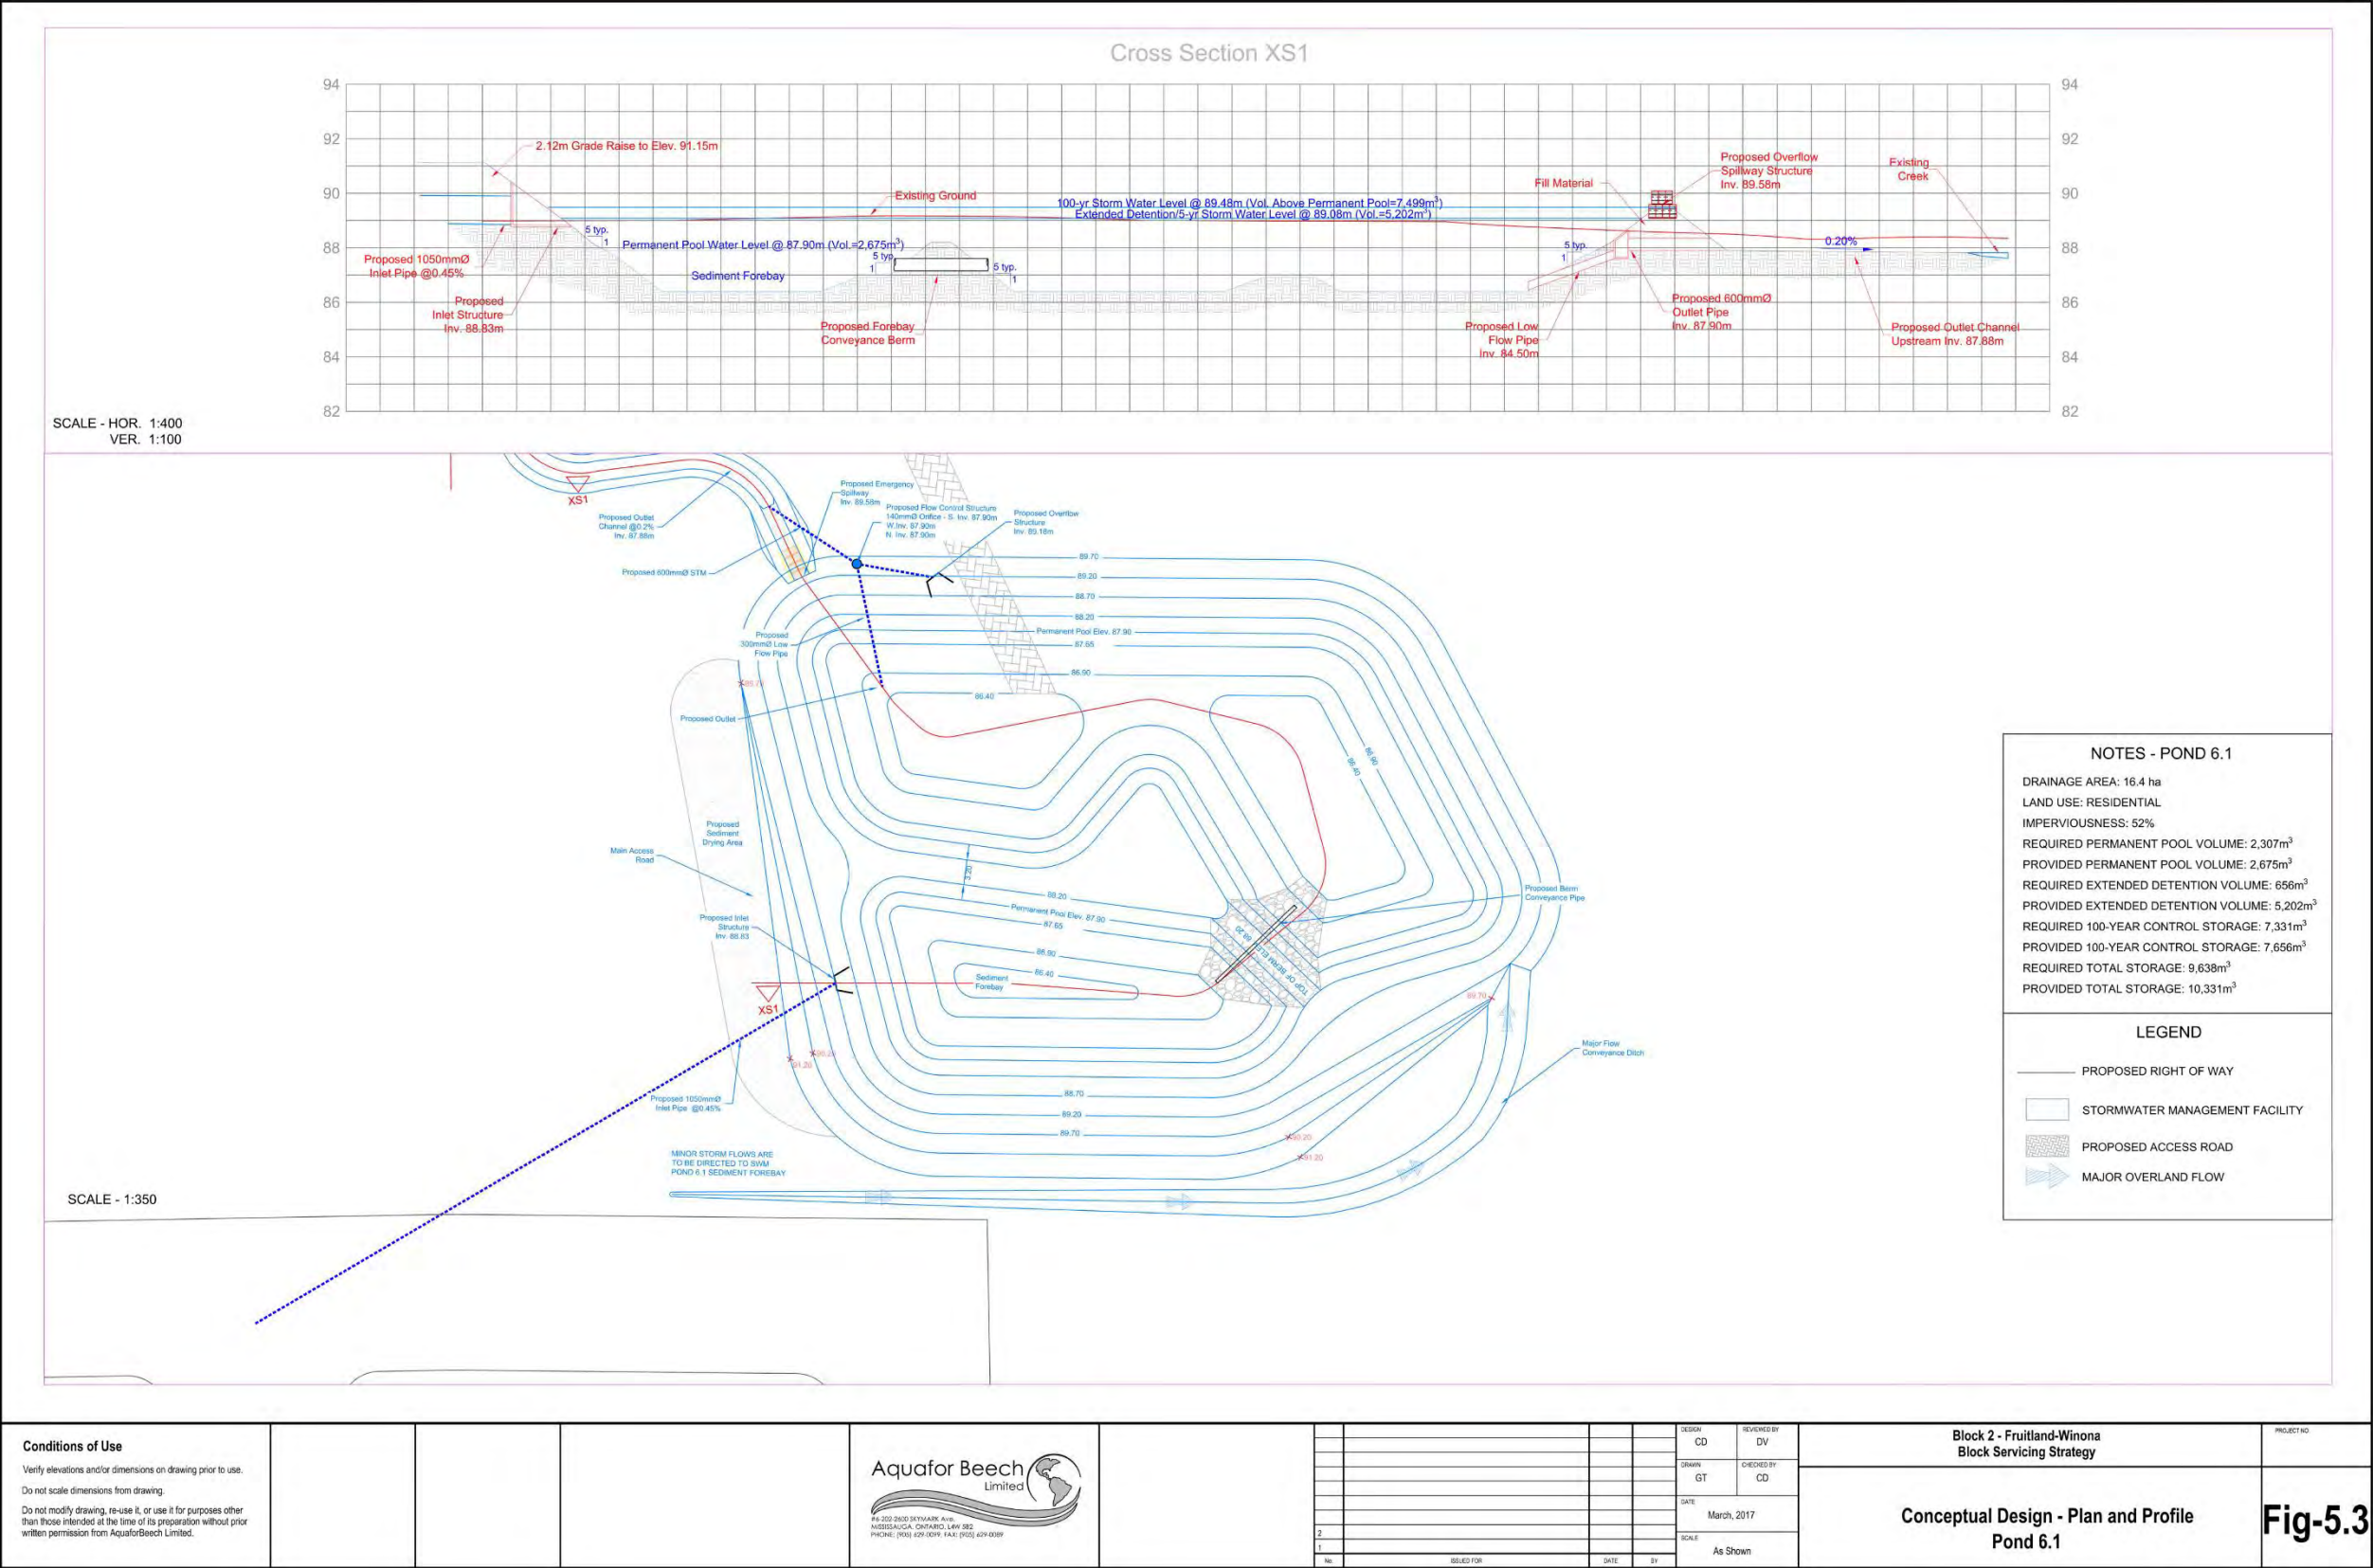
Pond 6.1 Conceptual Design – Plan and Profile
